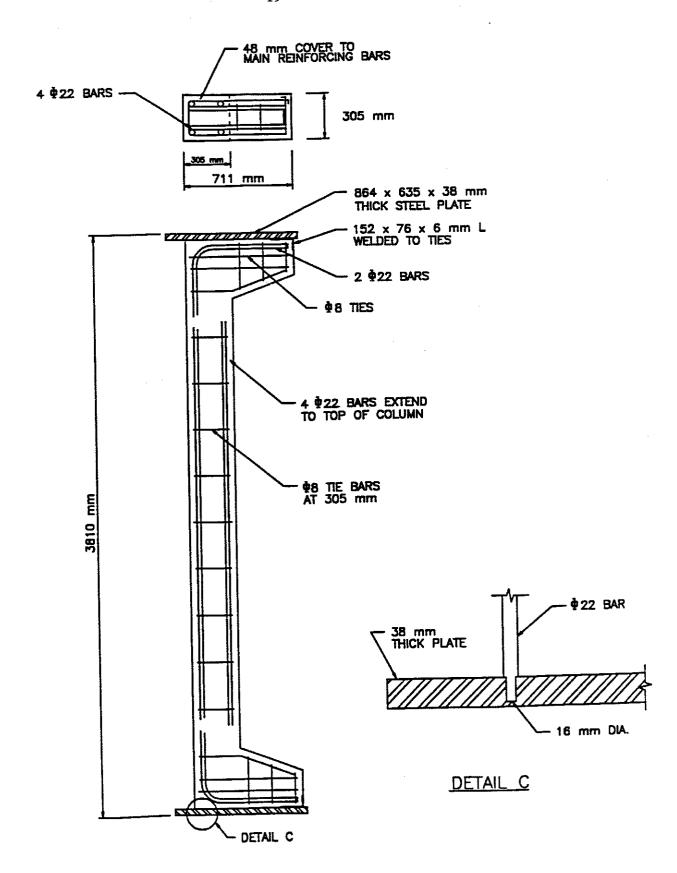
Elevation, Cross-Section and Finishing Detail: Column 2 (TFRI)
